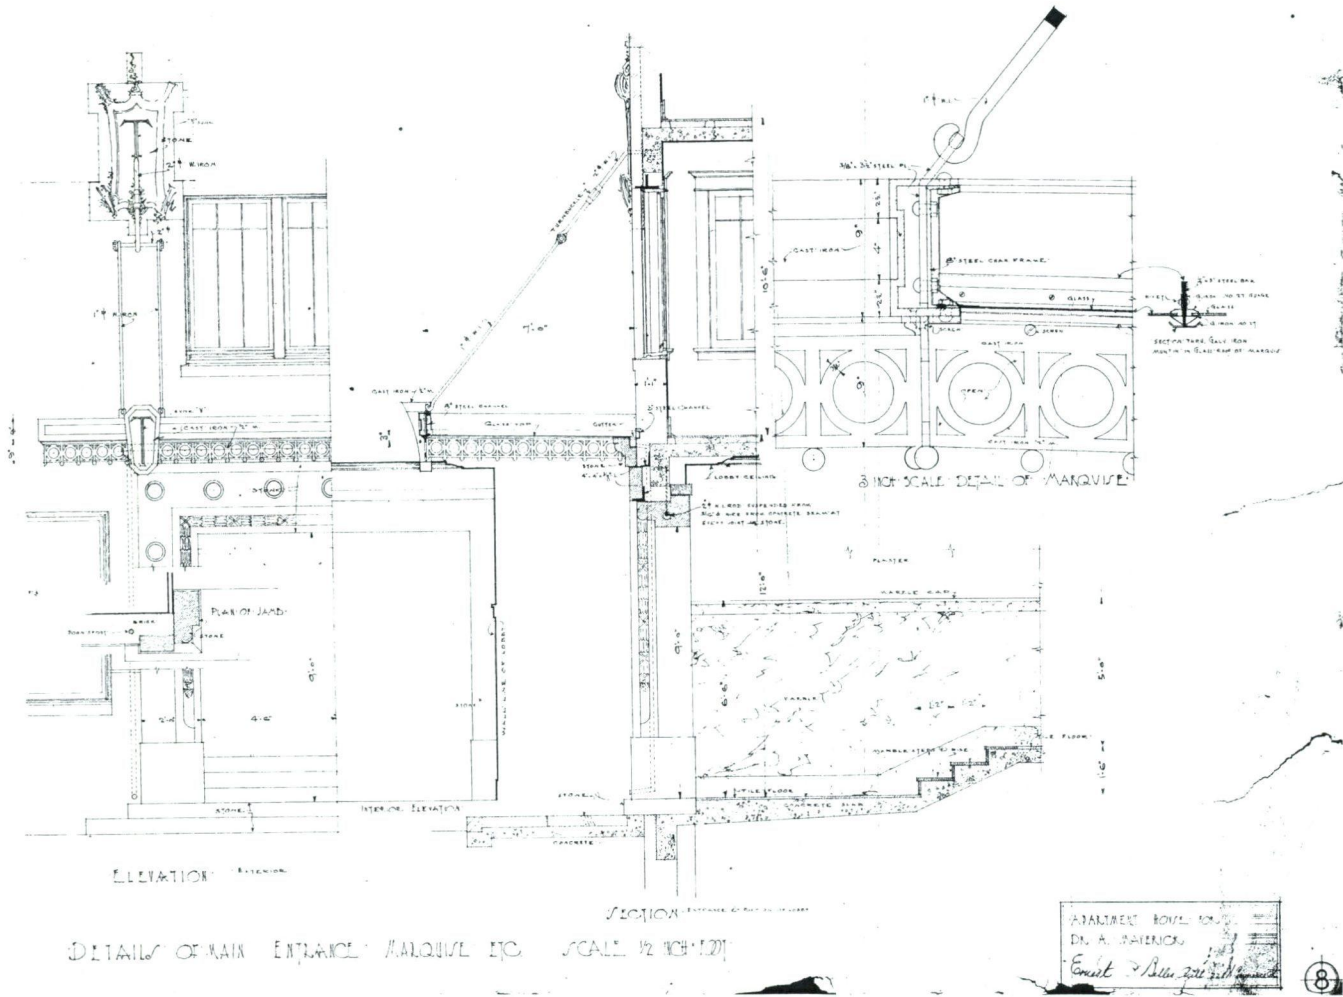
"Details of Main Entrance Marquee, Etc., Apartment House for Dr. A. Maverick," by Ernest P. Behles, Architect.
